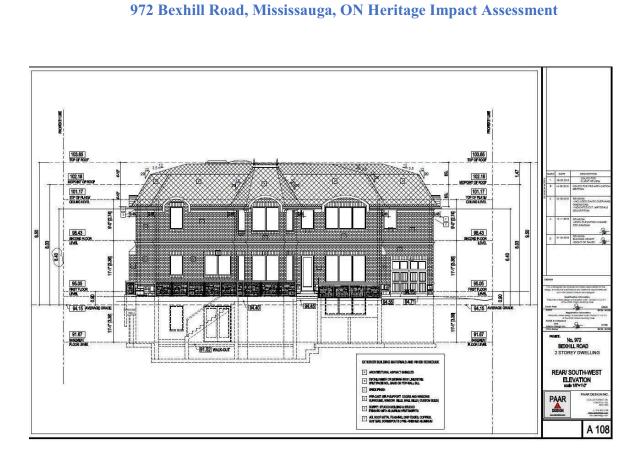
Rear Façade, Proposed Development. (Image from owners.)
